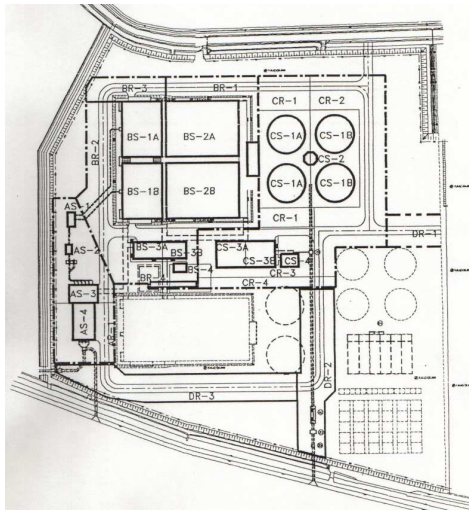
General Layout plan of the Kimhae Sewage treatment plant
